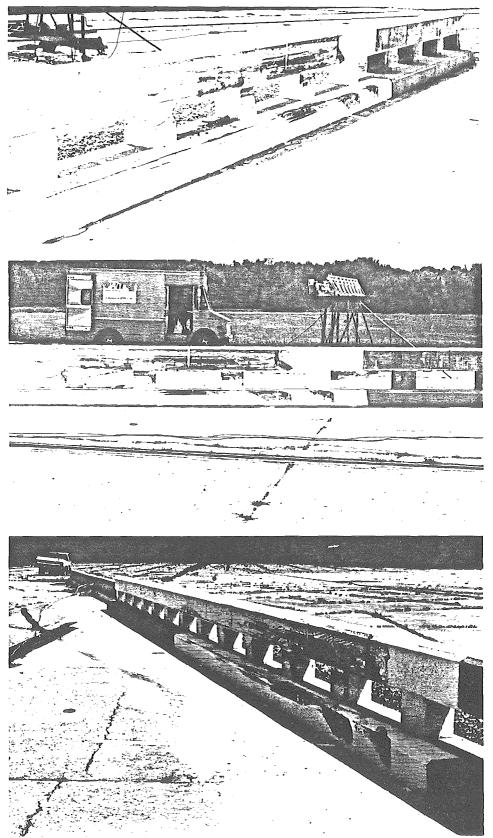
Posttest photographs of bridge rail system, test 1952-7-91.
